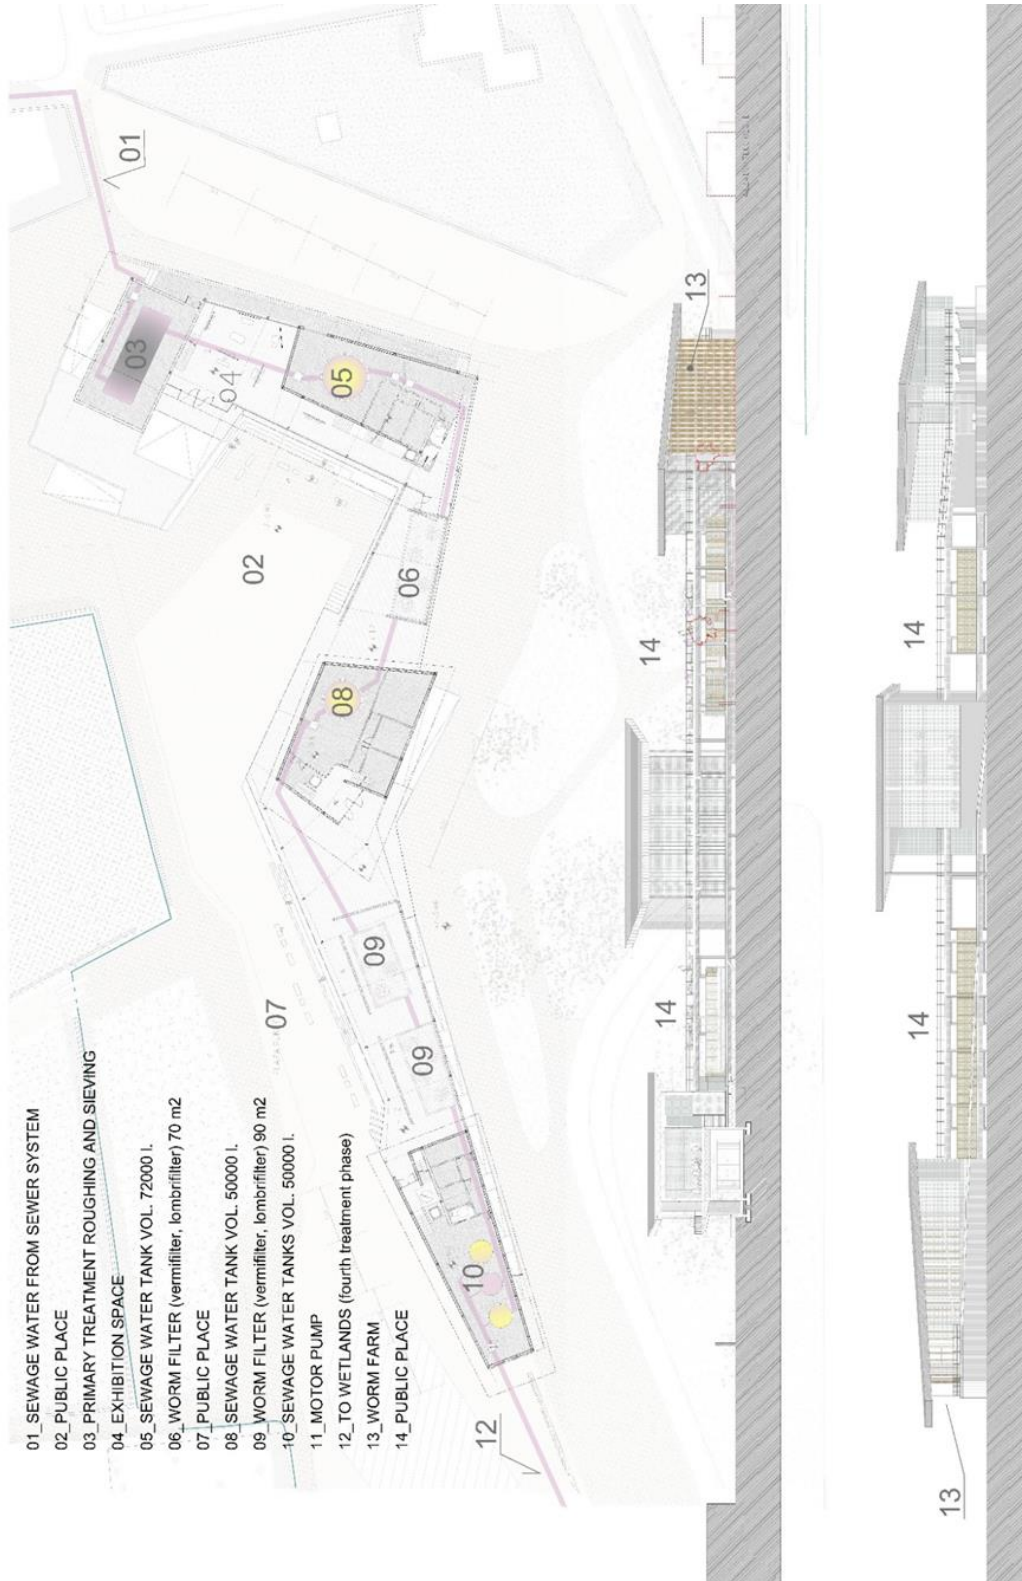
Plan, elevation, and section of the hybrid social architecture. The plan shows the water filtering infrastructure in the different components
